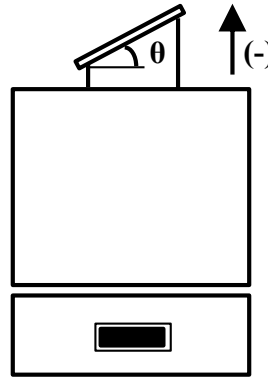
Cross-section and plan view of building model with attached panel on the roof
